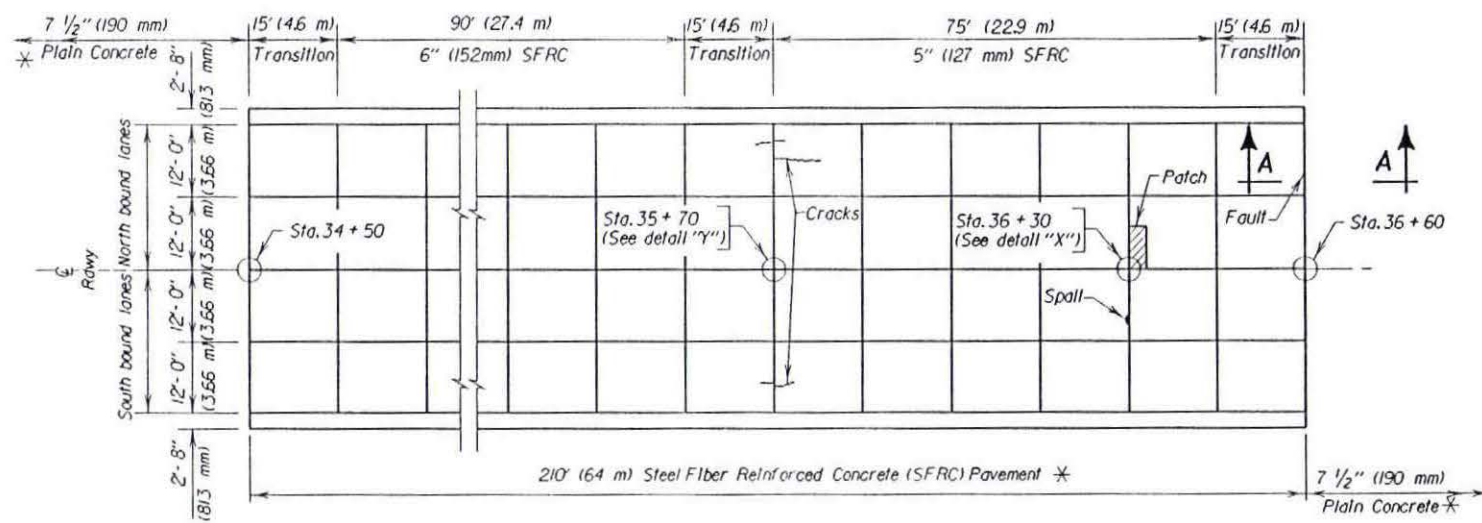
Inspection of SFRC Pavement (Haines Avenue, 5/21/1995)
